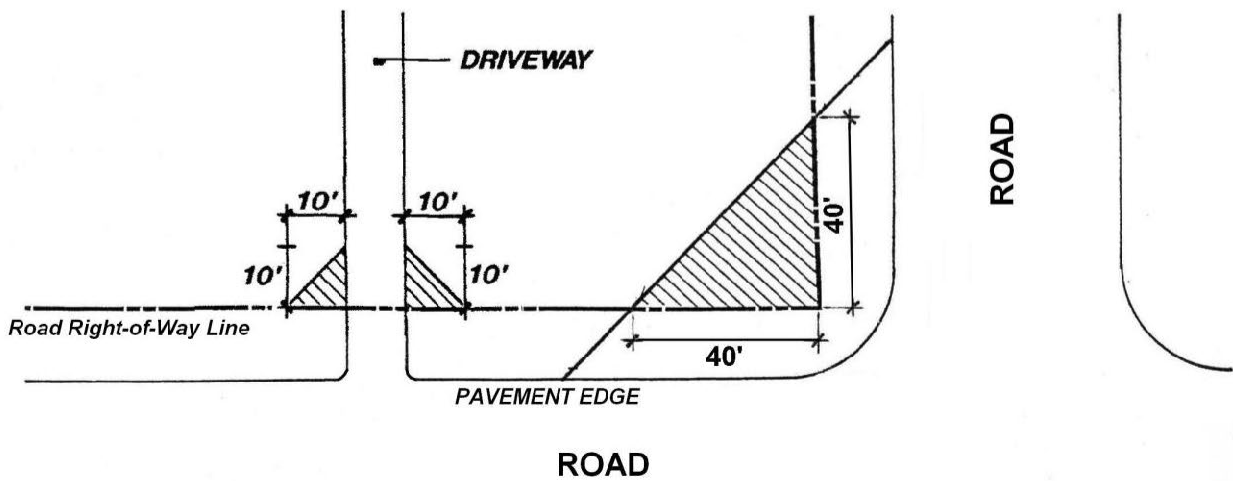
Unobstructed Sight Area at Road Corners [see Section 2.09(A)(4)]
